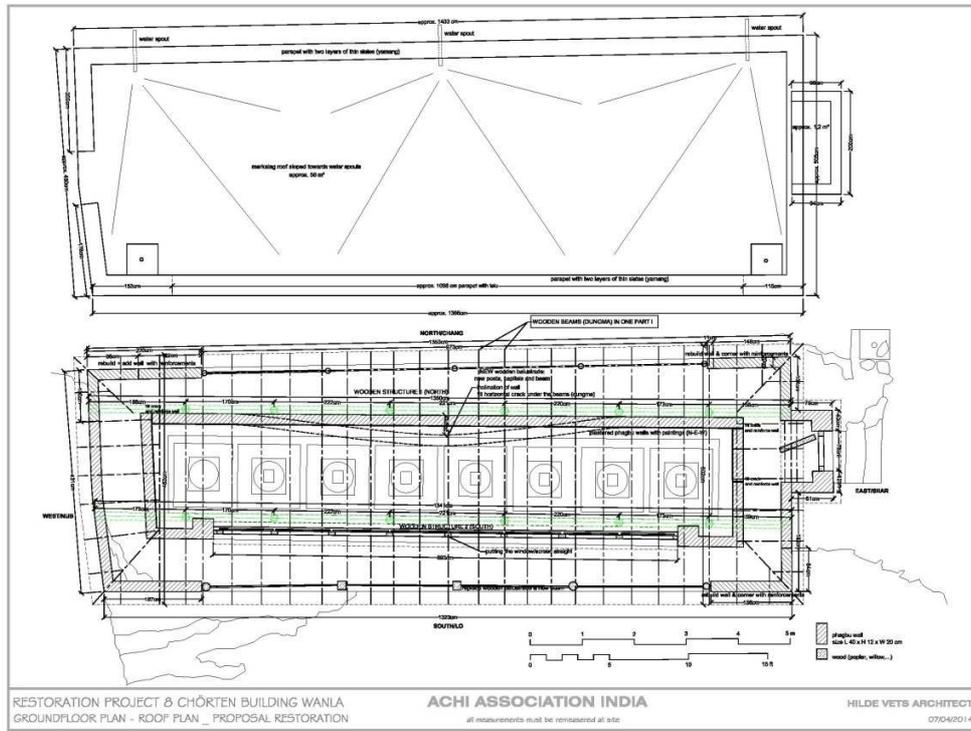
Restoration proposal: plan with two new wooden structures (in green) and roof, dd april 2014 (drawing: Hilde Vets)
